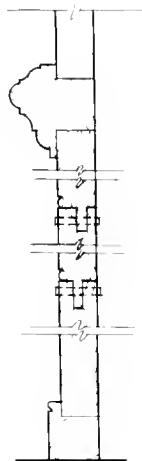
Wall Section This section is of the window sill at the west elevation and shows how the chair rail connects with the raised paneling below at other sections along the wall.
